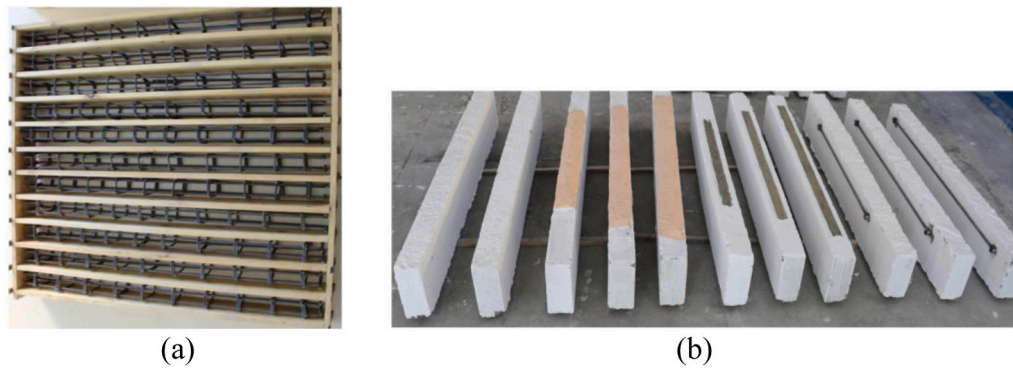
Preparation of beam specimens (a) formworks, (b) all-prepared beams.
